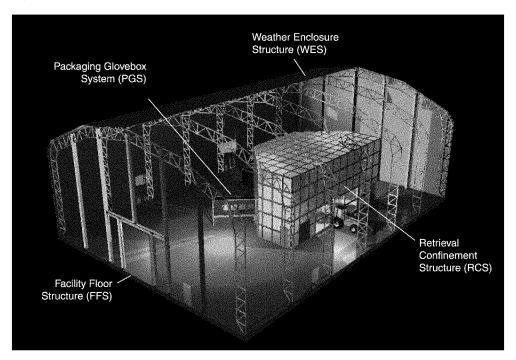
Facility layout of the OU 7-10 Glovebox Excavator Method Project.
